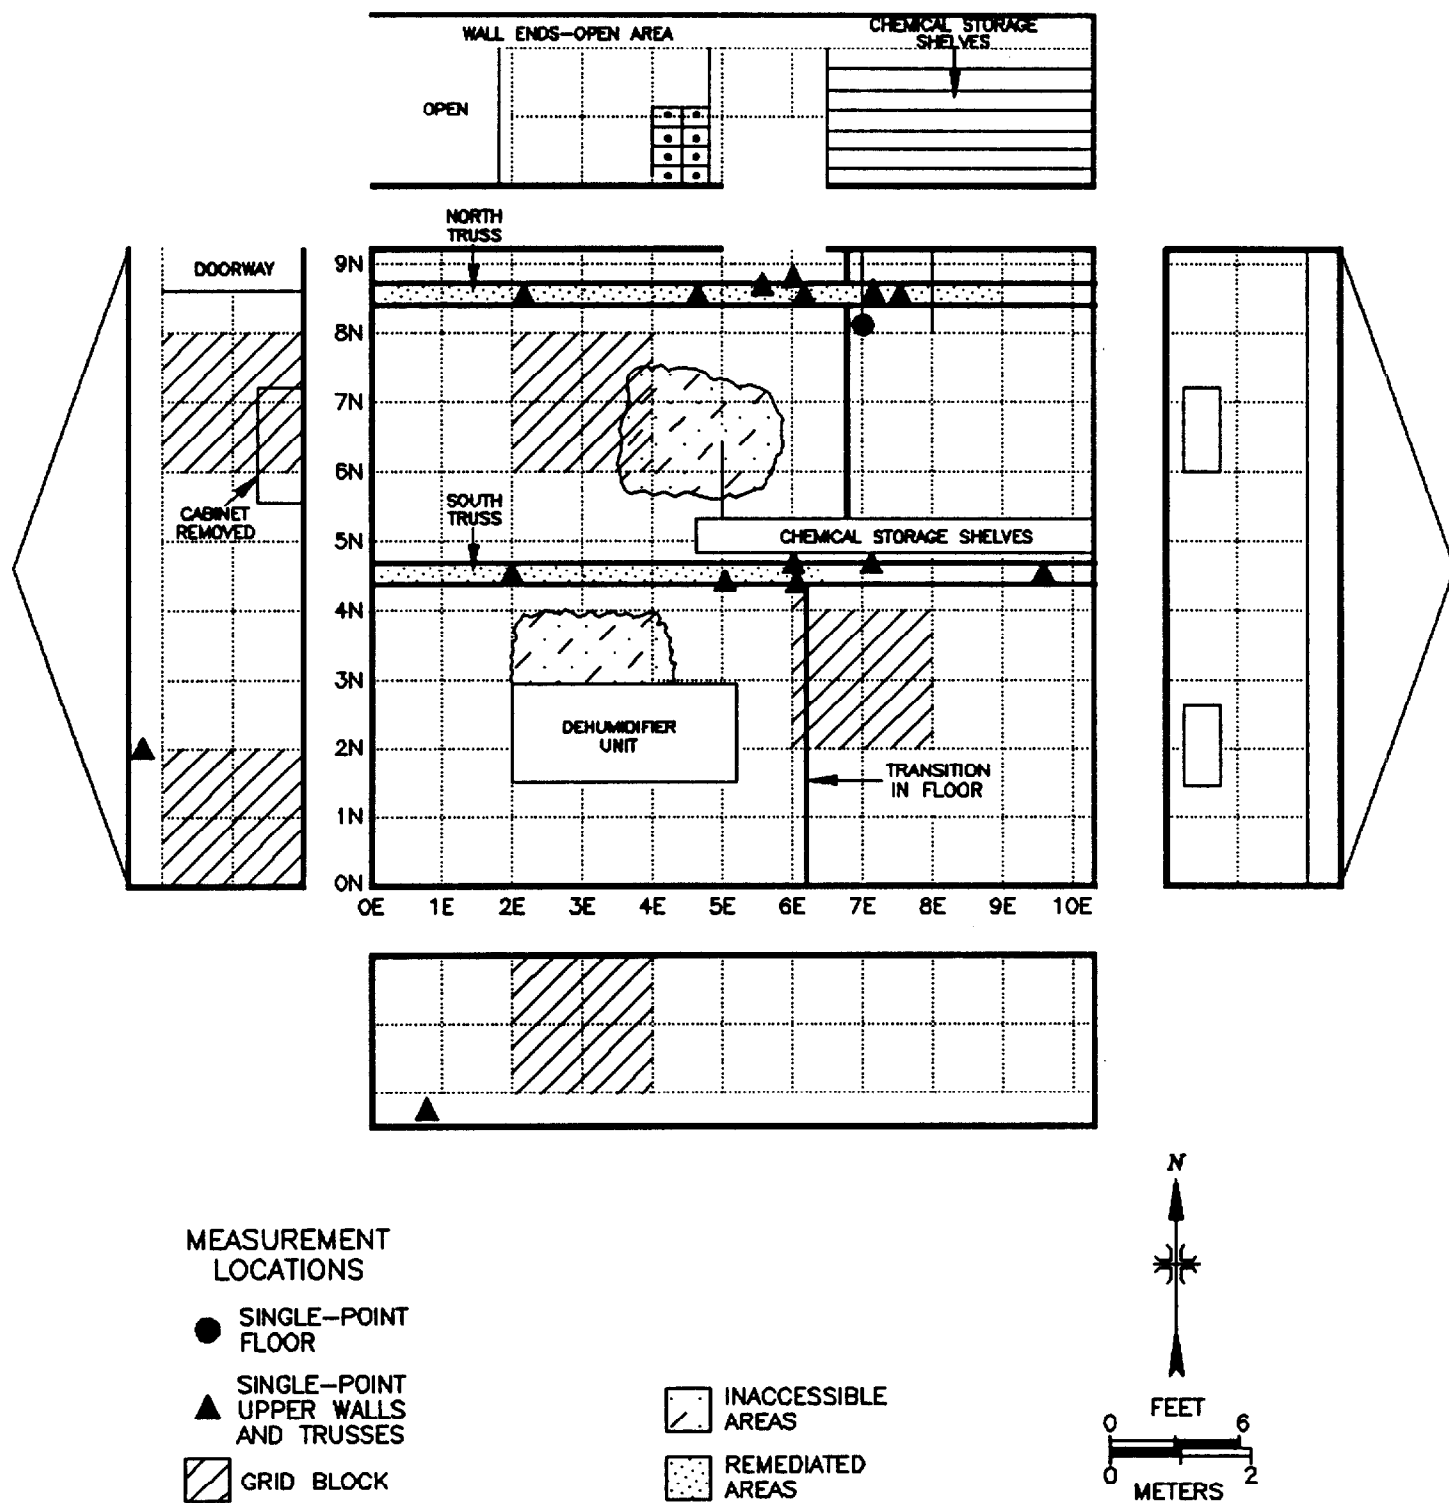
Building 17, Second Floor Storage Area – Measurement Locations
